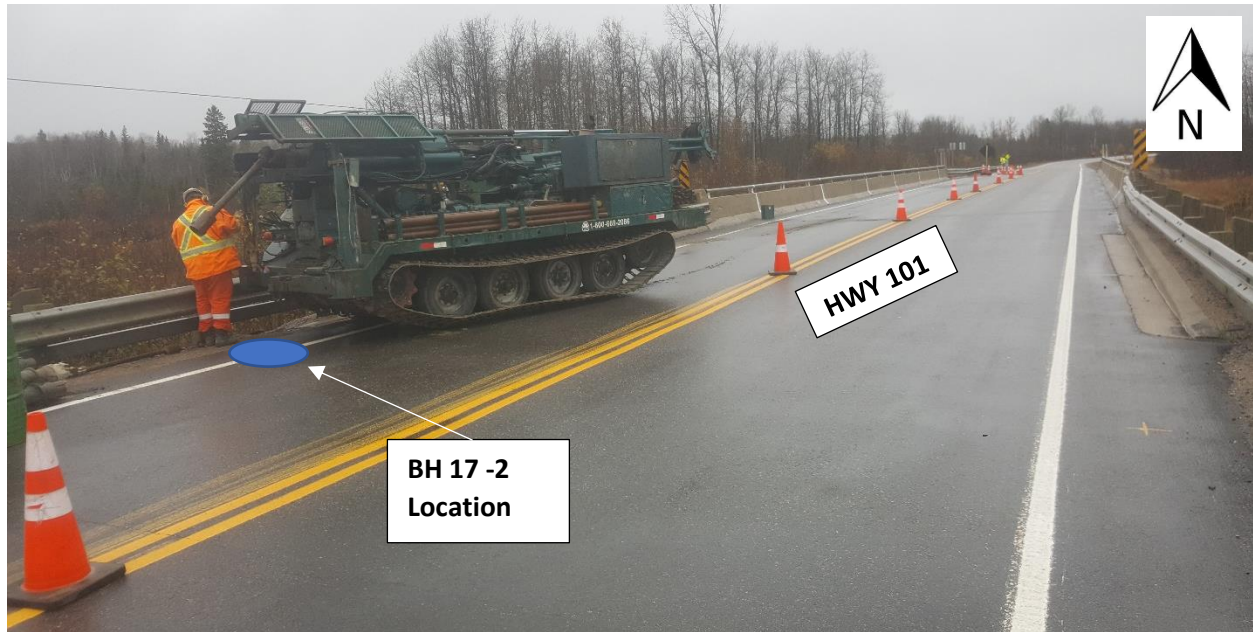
Looking towards North of Highway 101 (October 2017)
